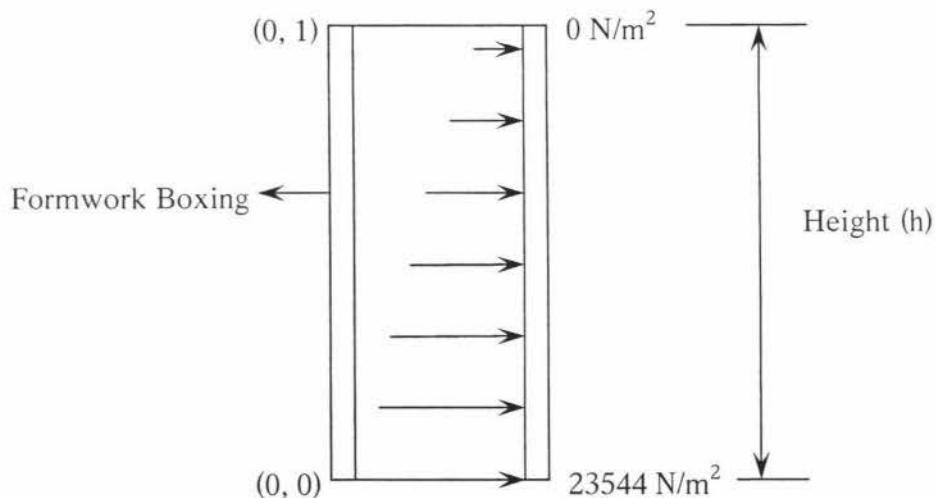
Pressure triangle of concrete on the foundation formwork boxing
